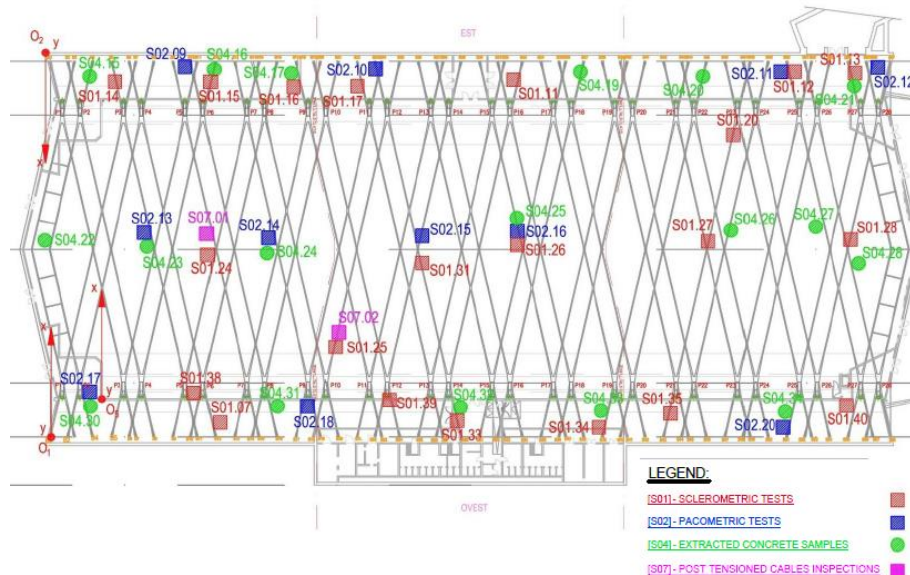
Pavillion V: Test positions at the roof level (MASTRLAB DISEG, 2019)
